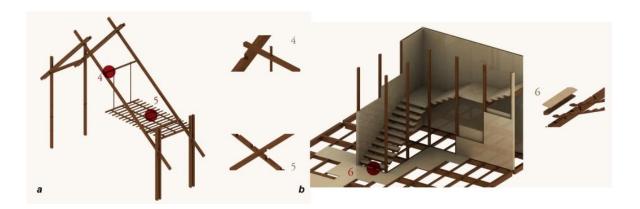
a. Detail of floors joints in the upper level (F.Stefano); b. Detail of the staircase's structure and connections (V.Dario)
